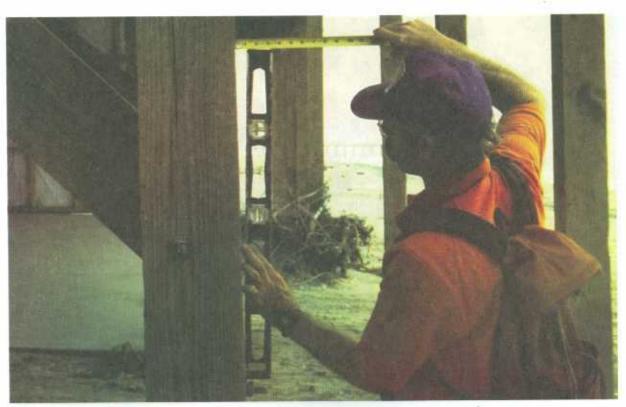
One of several buildings observed to be leaning landward that were suspected of having been constructed to current North Carolina State Building Code requirements.
